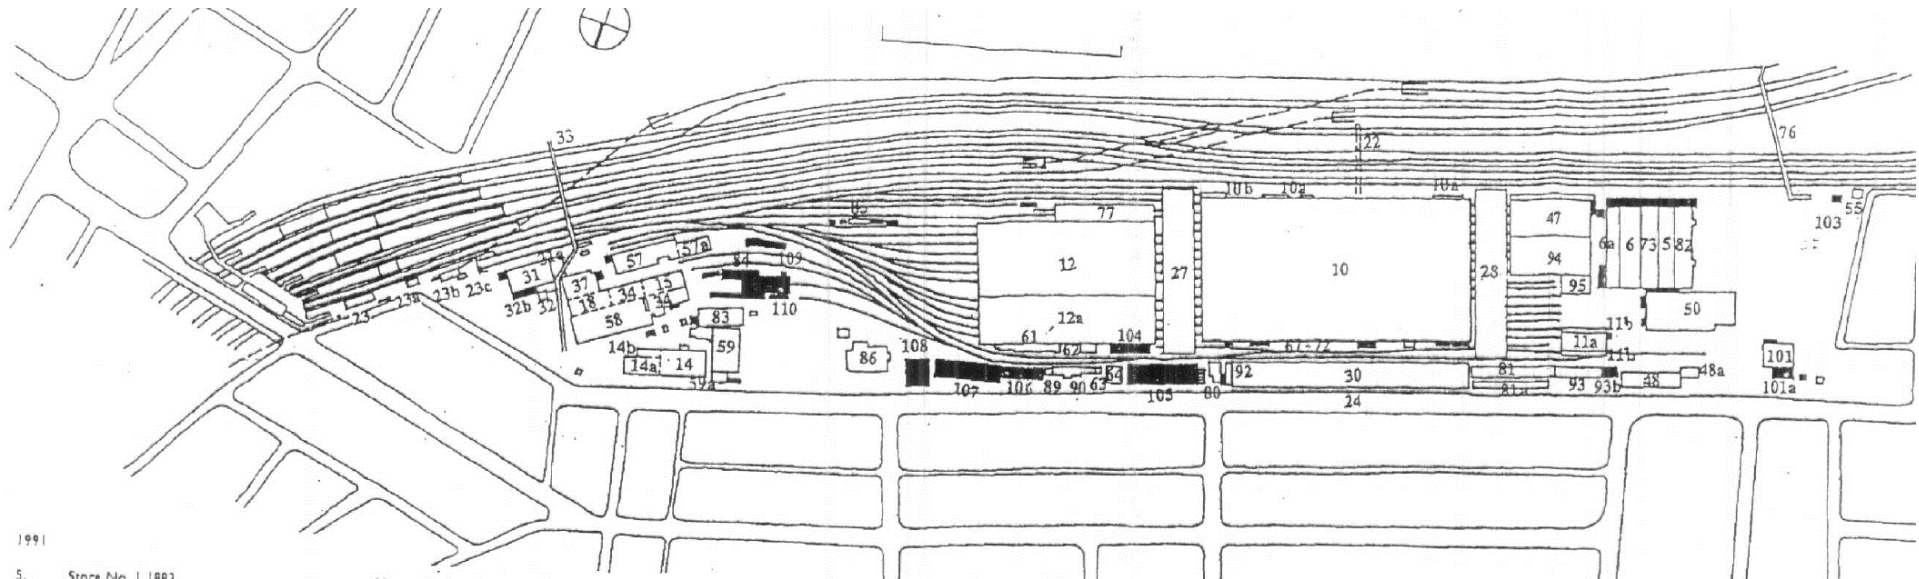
Buildings indicated on site in 1942 (Source: DPWS)
